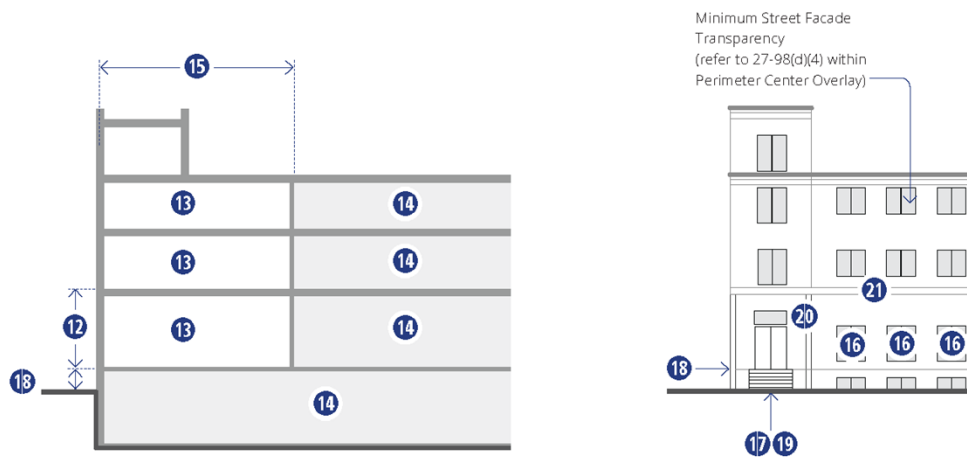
Civic Building: Floor-to-Floor Height & Use Requirements
